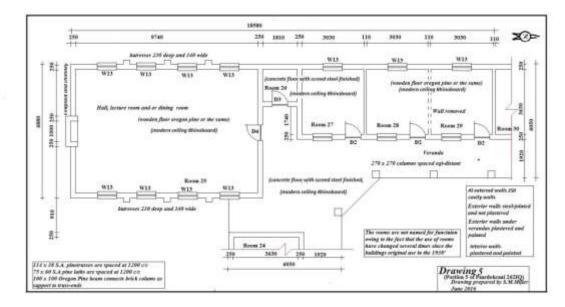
Above. Layout of rooms 25 to 30. (Drawing S.M. Miller 2016.)
